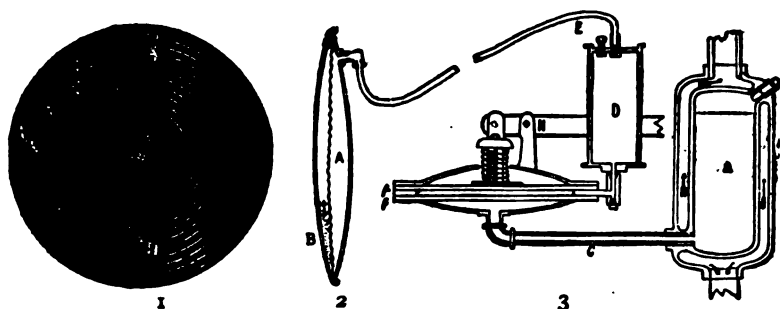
The Powers Thermostat for Hot-water Heaters.
